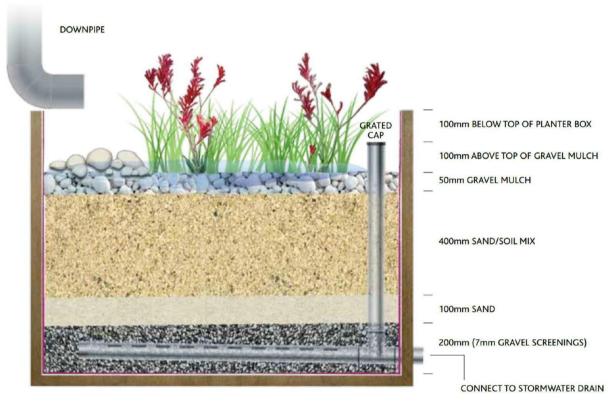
Typical Cross-section of a planter box raingarden (Source: Melbourne Water - Building a planter box raingarden)
